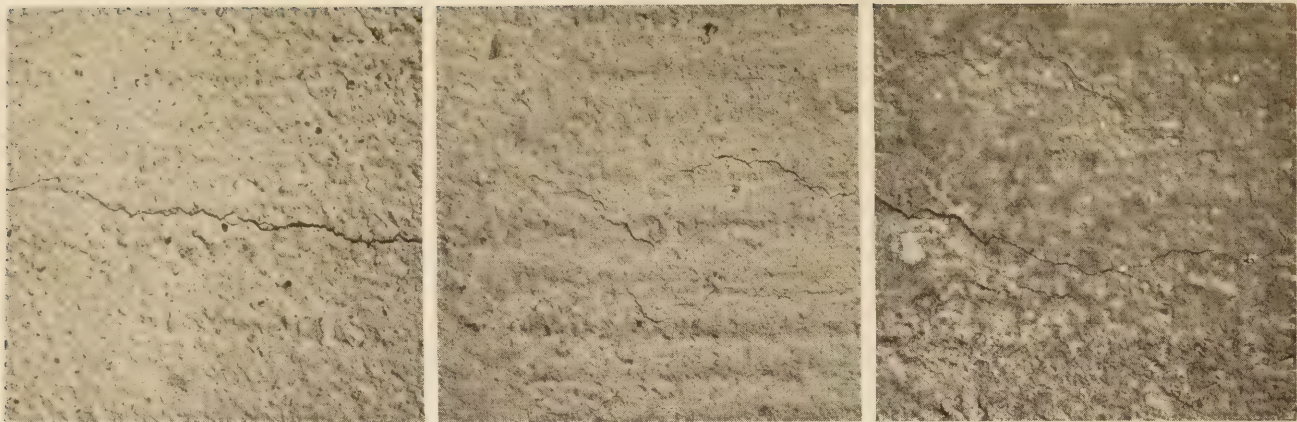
SECTION 1, DRY SUBGRADE, NO CURING. LOCAL SHRINKAGE CRACKS CAUSED BY RAPID DRYING OF THE CONCRETE DURING THE EARLY CURING PERIOD.
